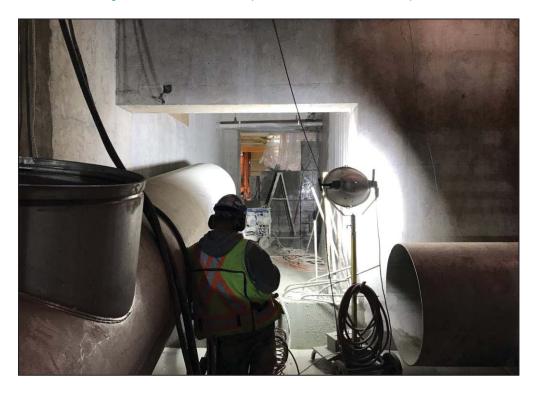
Clover Point Pump Station- Concrete cutting of the passageway into the existing pump station.
